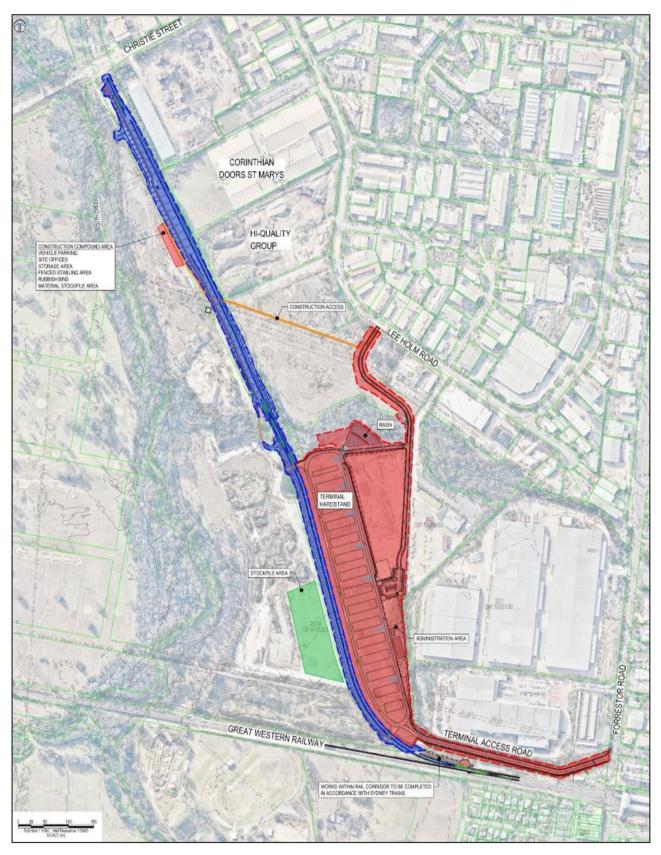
Map of project site location (from Draft Instrument of Modification)
